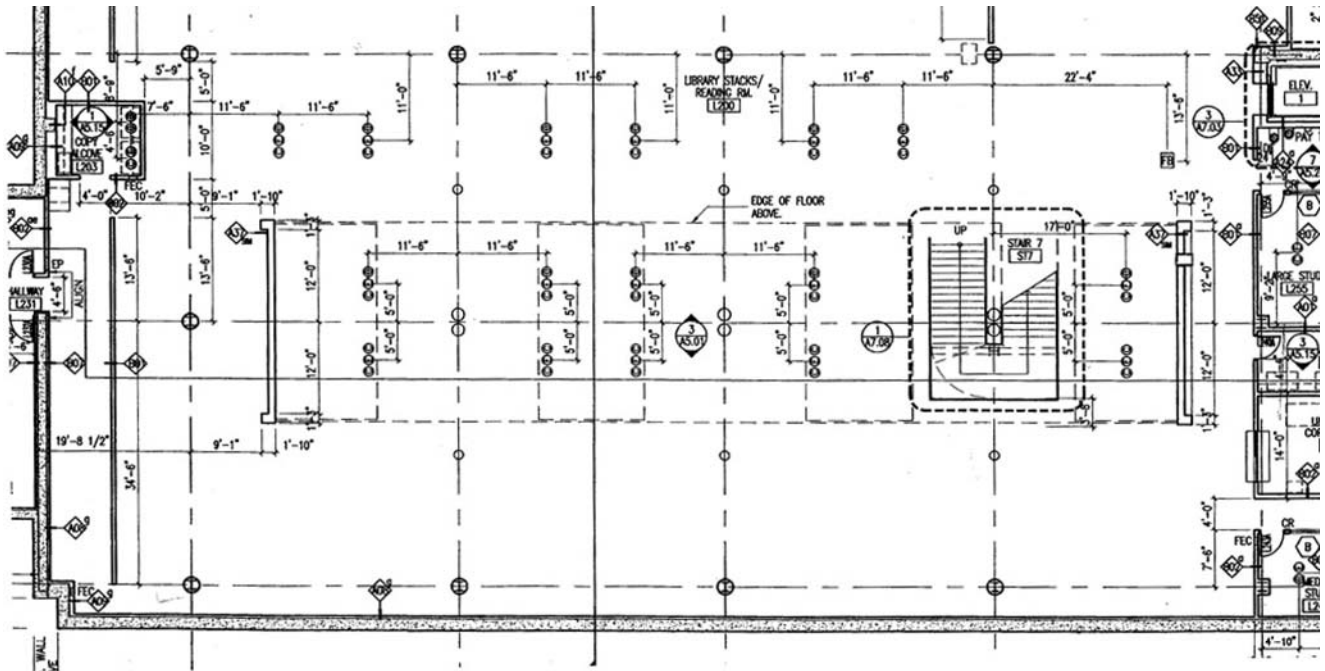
Level L2 Library Reading Area Floor Plan
